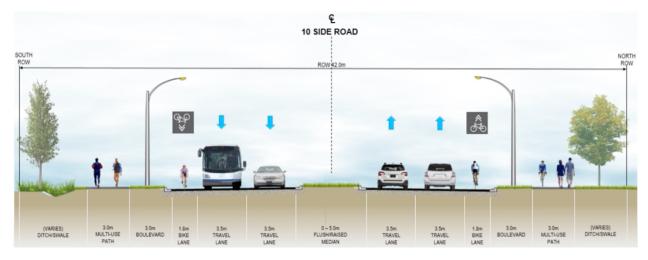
Halton Region conceptual cross section design for 10 Side Road
